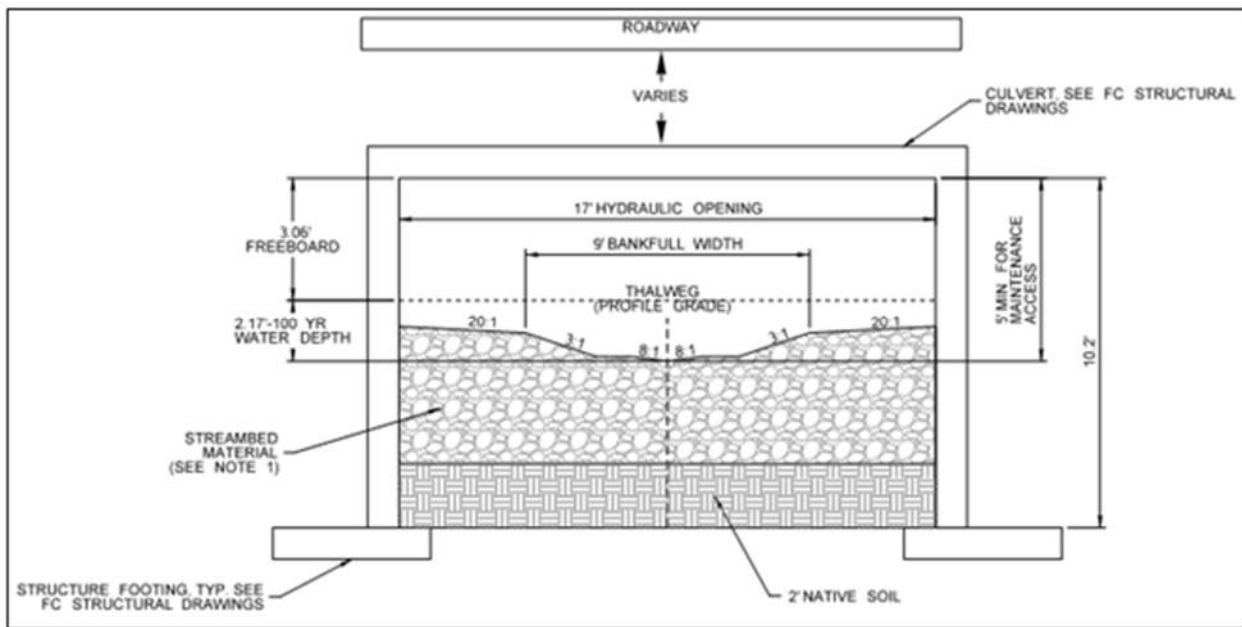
Typical Section Through Proposed Structure Crossings at NE 132nd Street and Totem Lake Boulevard NE
